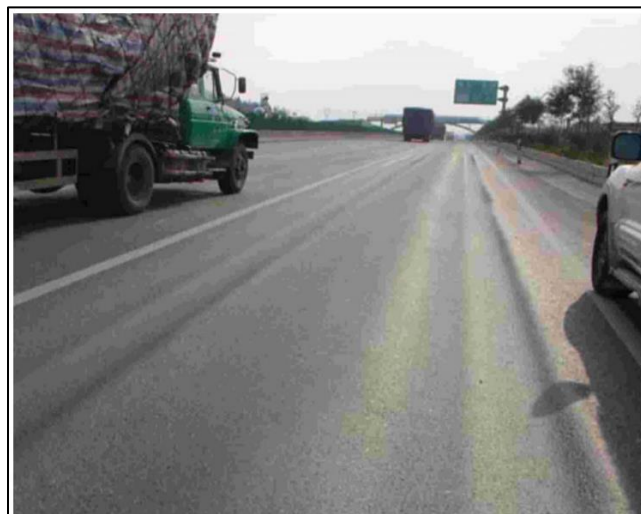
Severe rutting in pavement surface (H. Wang, Zhang, & Tan, 2009).
